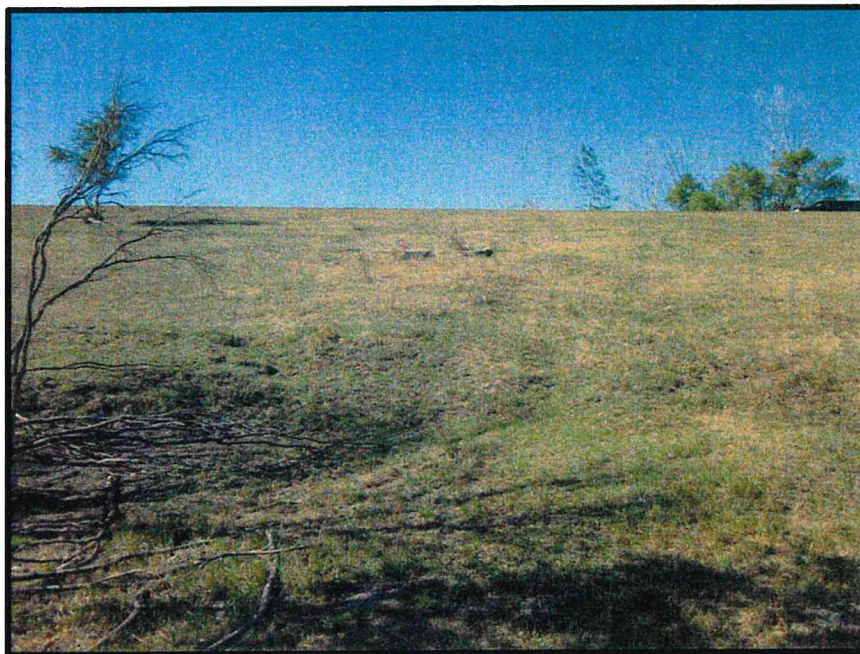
Direction: Northwest. View of the west end of Wetland 2. Note that there is no culvert under the road embankment.
